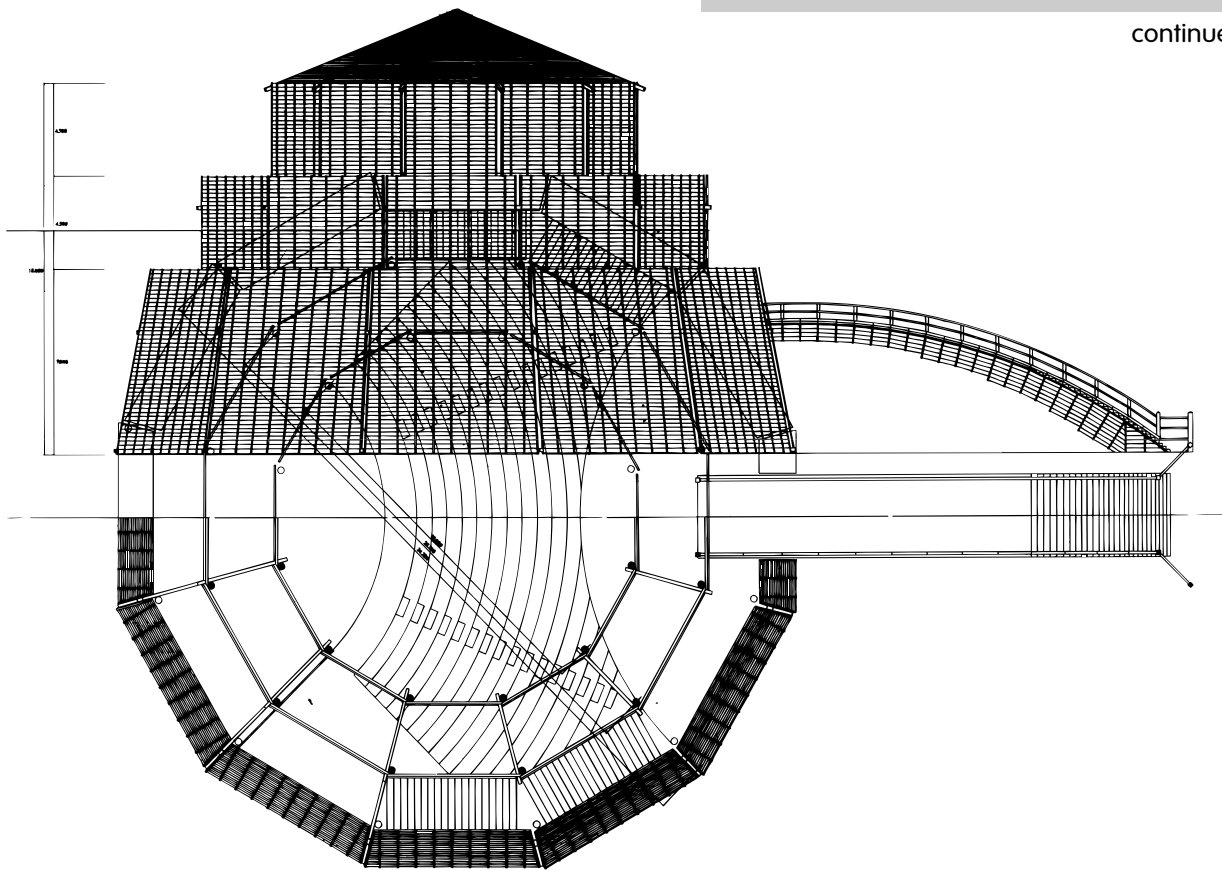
Karaza Theatre, Tadao Ando, 1987–88. Plan and elevation.
